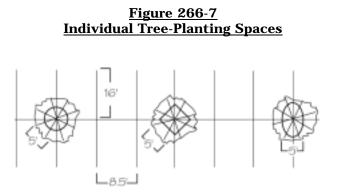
illustrates the minimum dimensions of individual tree-planting spaces. Such spaces need not be square, but they must have a minimum interior dimension of five feet and meet other requirements for protection of the trees from damage.
